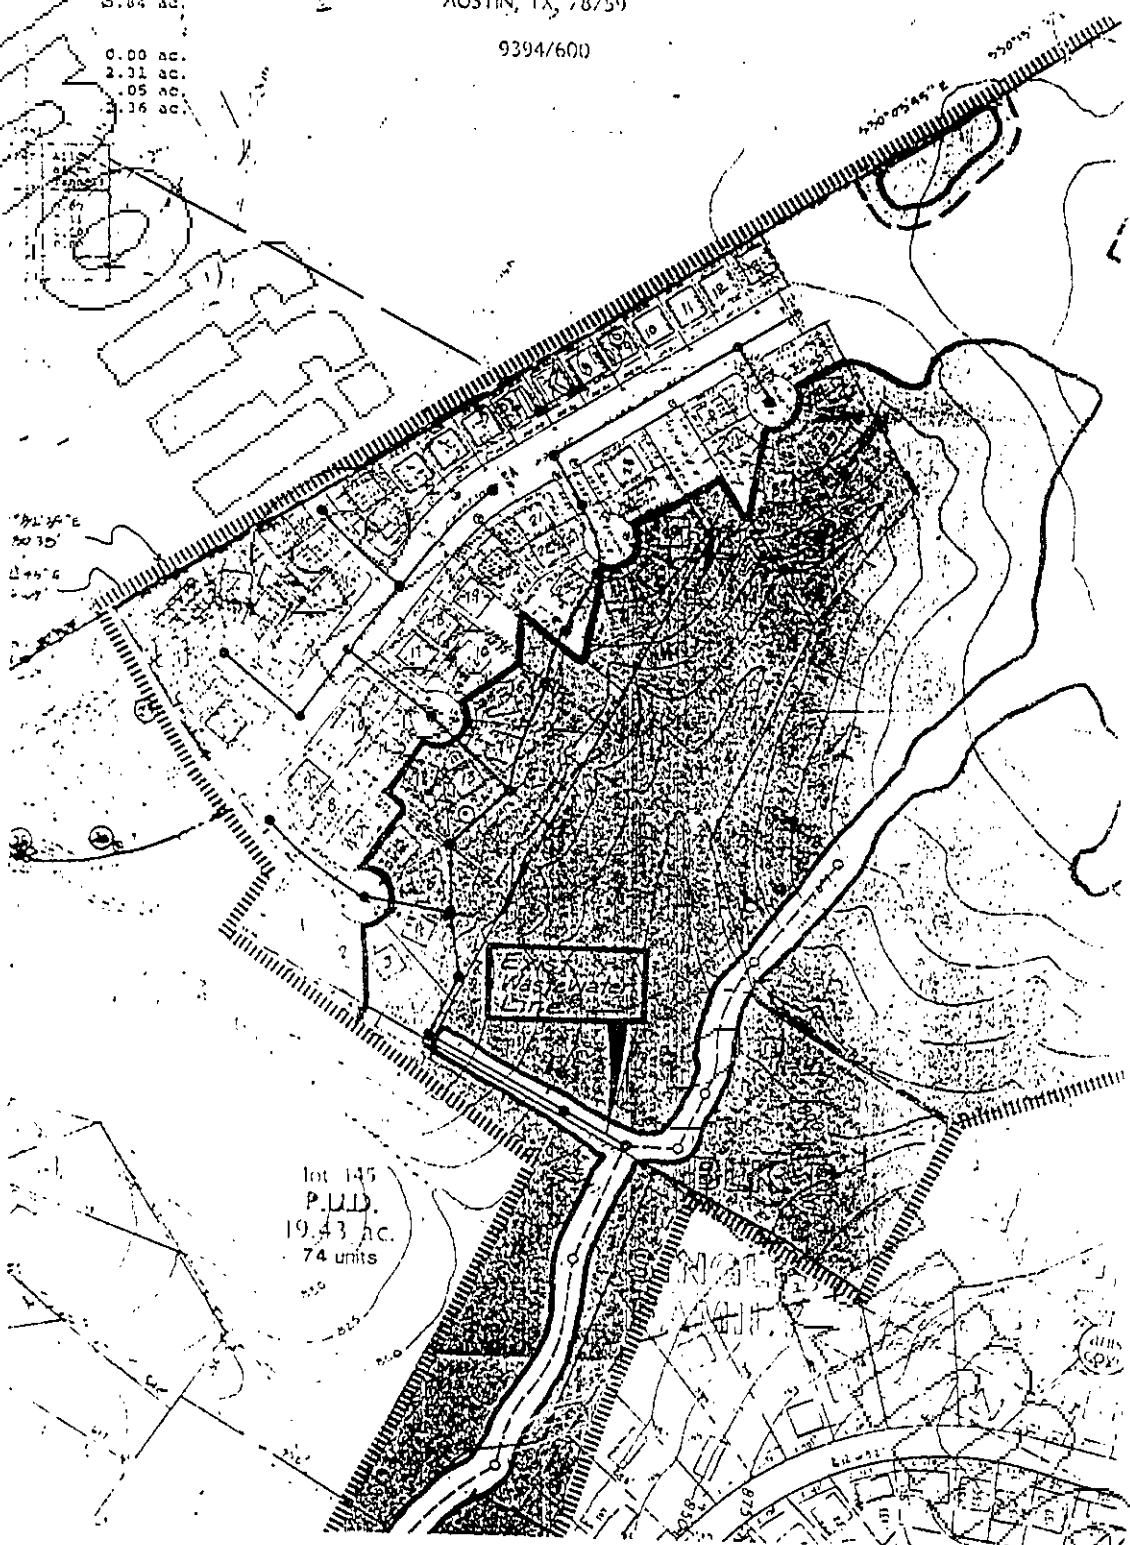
Lots (shaded area) in Section 5-B proposed to be left undeveloped by the applicant.
